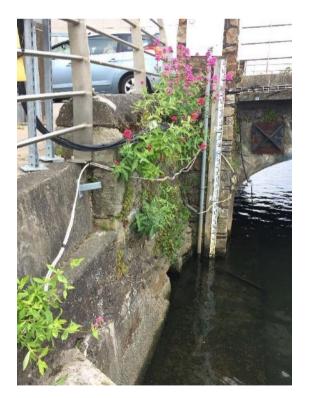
Wall abutting the south-eastern side of Arklow Bridge, facing northwest
